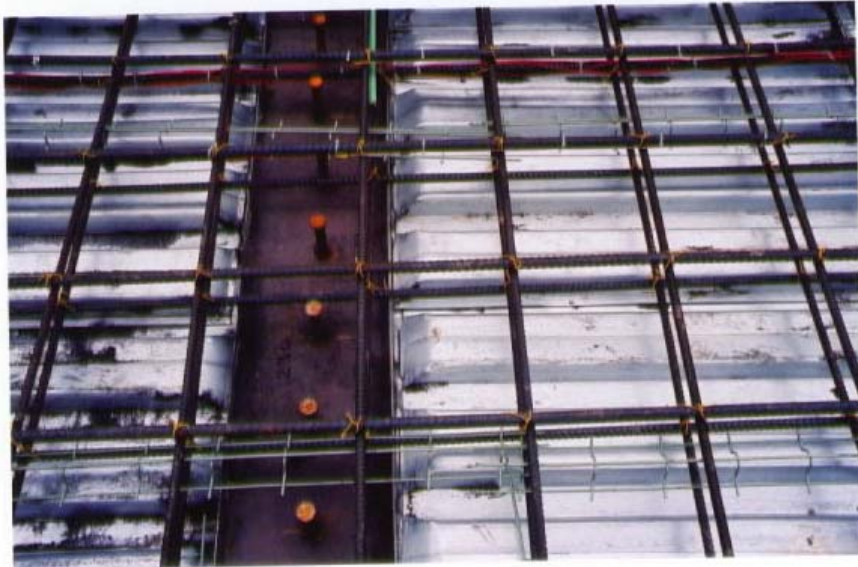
Photograph of reinforcing steel and a girder with studs.
